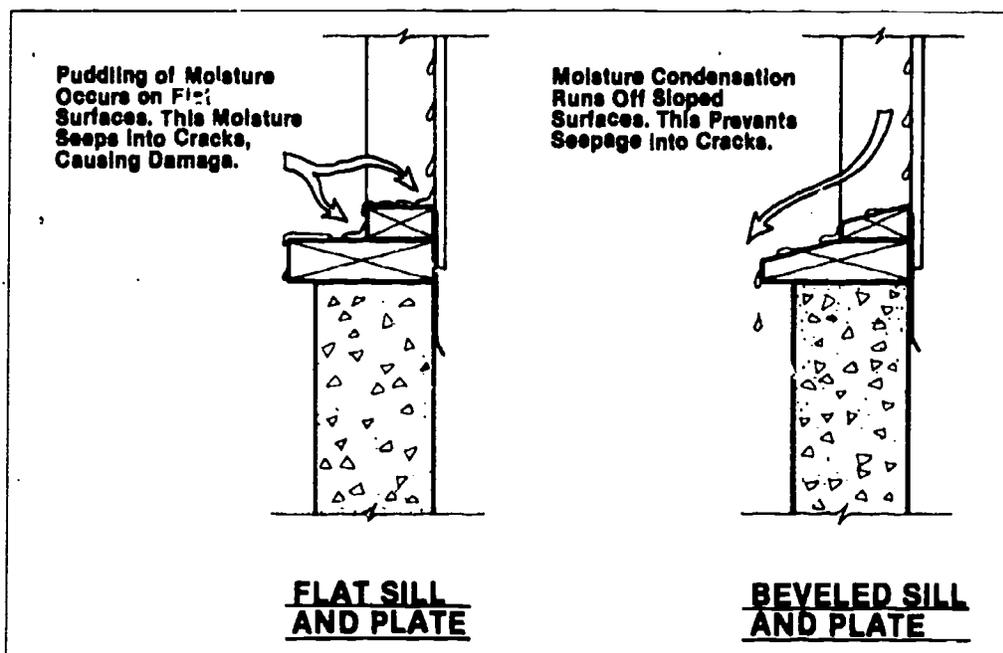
Sill plates and other structural components should be bevelled to permit moisture to run off
